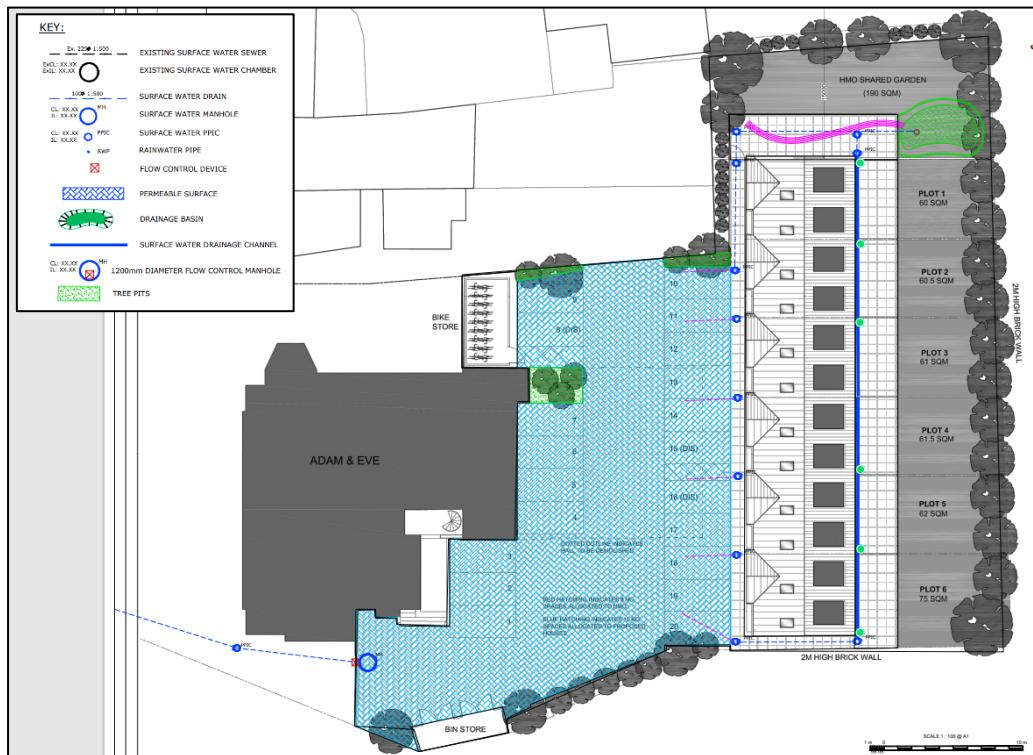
Indicative drainage layout plan showing the proposed location of SuDS.
